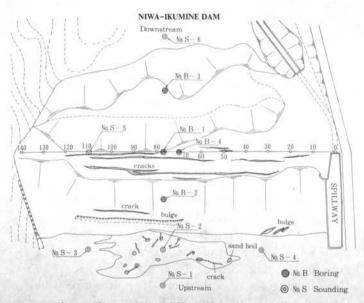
Plane of Damage to Niwa-Ikumine Dam
